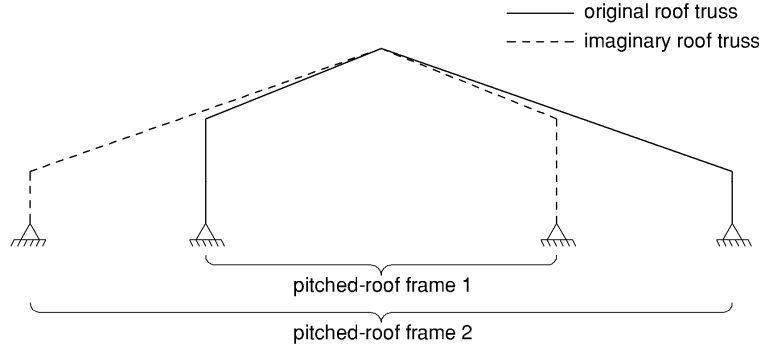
Asymmetric pitched-roof frame split up in two independent symmetrical pitched-roof frames.
